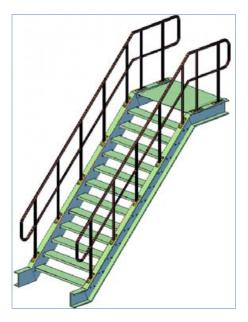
HANDRAILS WITH LOOPED ENDS
